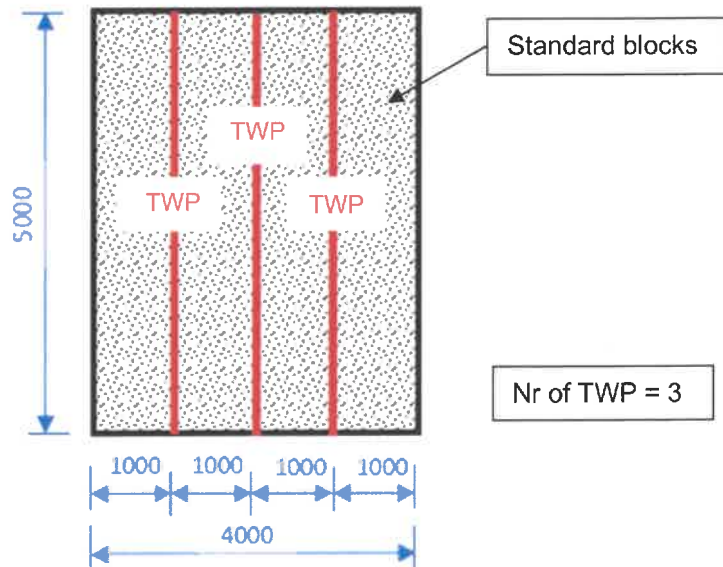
Type 1 wall panel designed with TWPs and standard blocks
